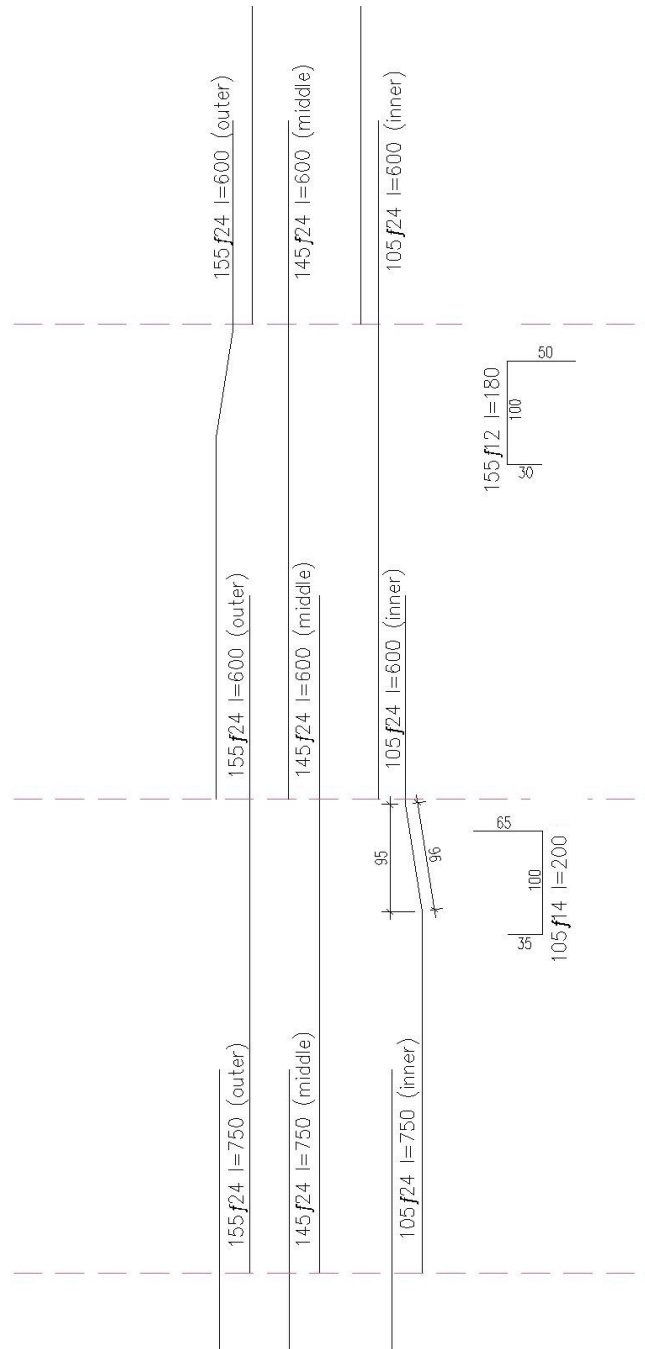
Geometrical and reinforcement properties of the minaret (Altering Cross-sections)
